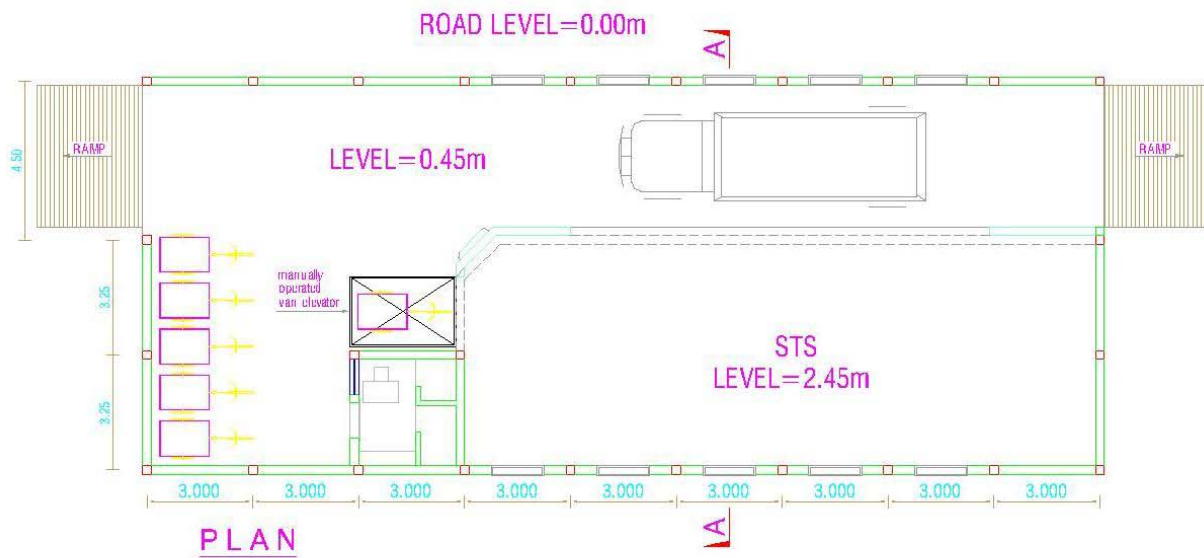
STS – 2 Uttara Rajuk College Preliminary Plan
